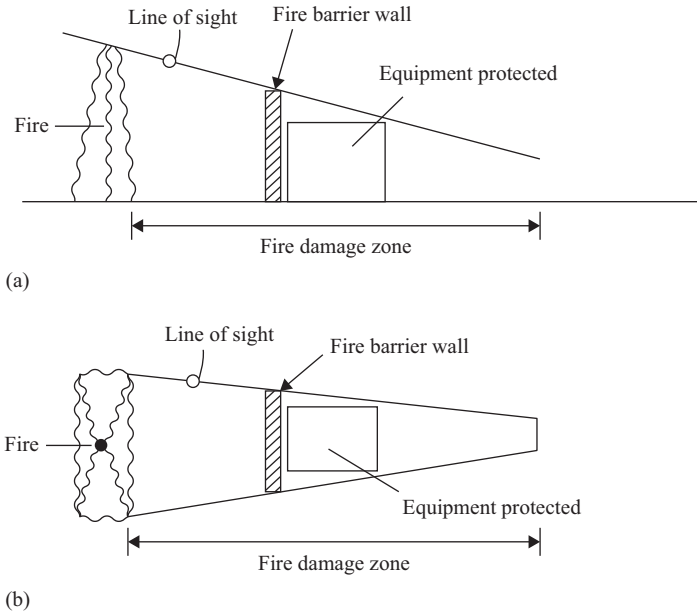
Fire barrier – principle of protection: (a) side elevation and (b) plan elevation
